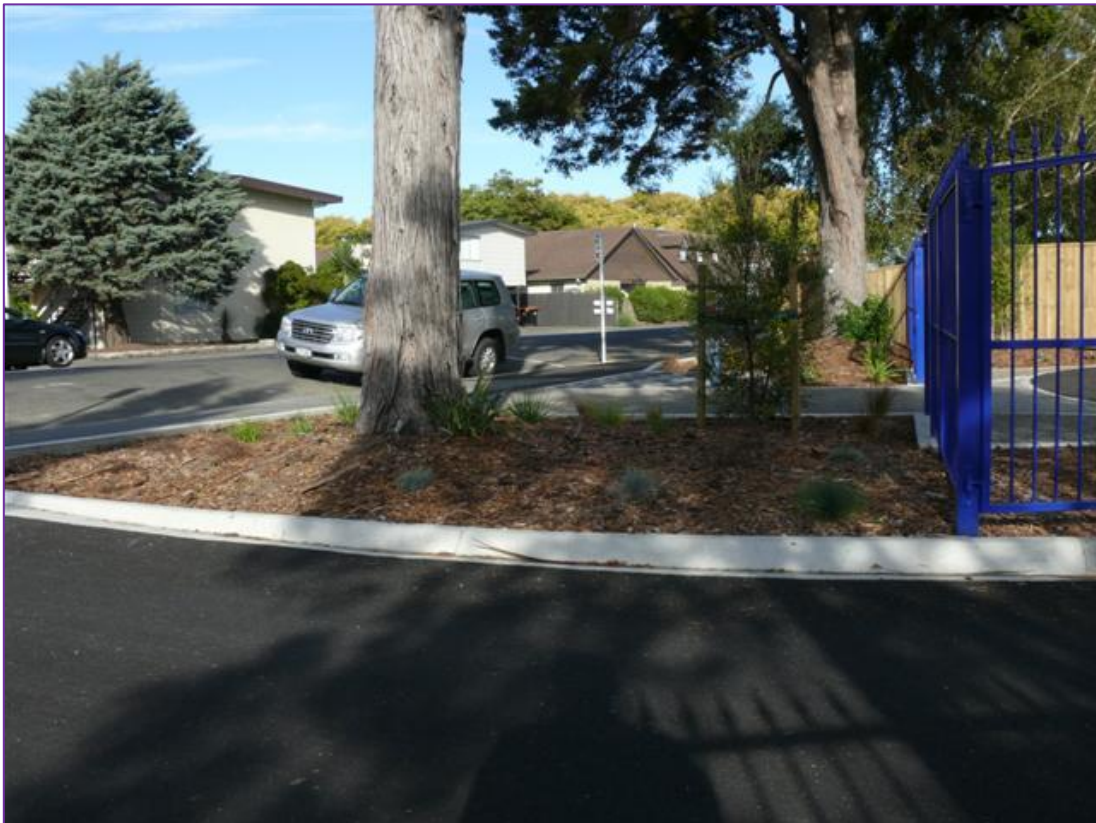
new tarmac and concrete kerbing. This will crack and the trees will be blamed.
